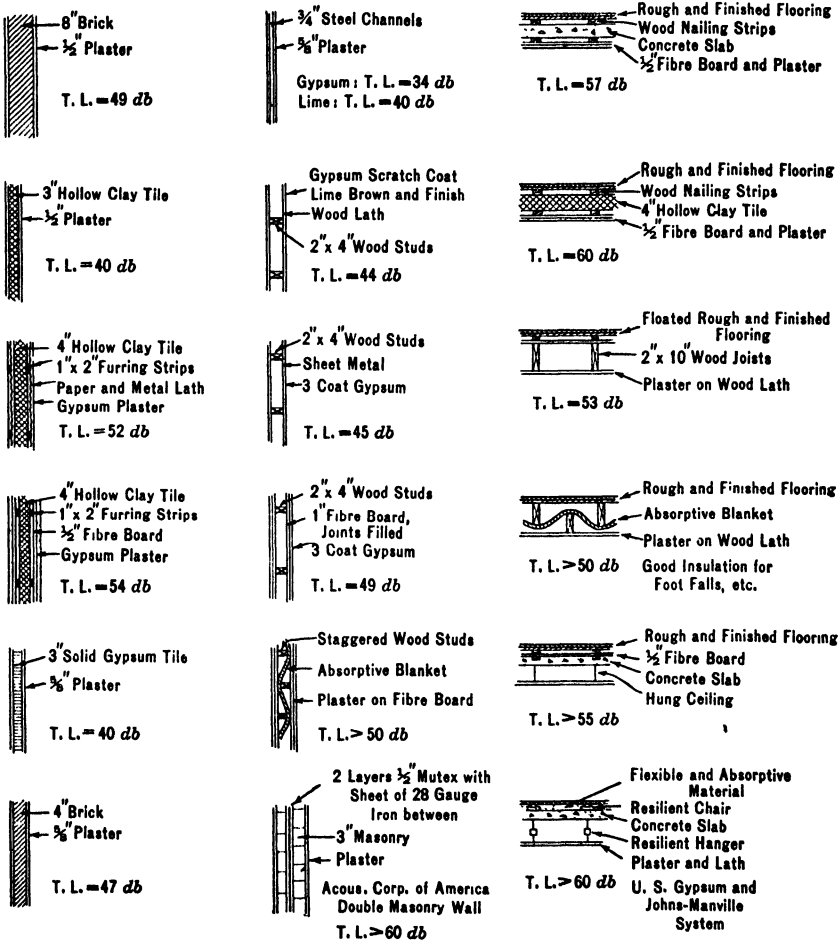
Plan and sectional sketches of wall, floor, and ceiling partitions having a high degree of sound-insulation.
